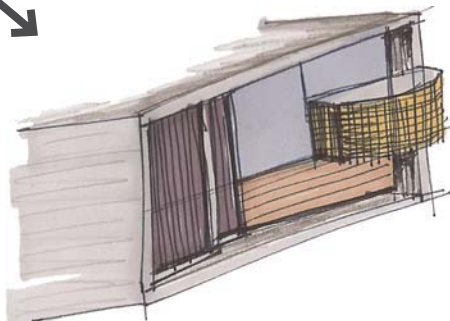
Corrugated screens are placed on the façade where light needs to be blocked from the interior. This would be done in front of projection rooms
